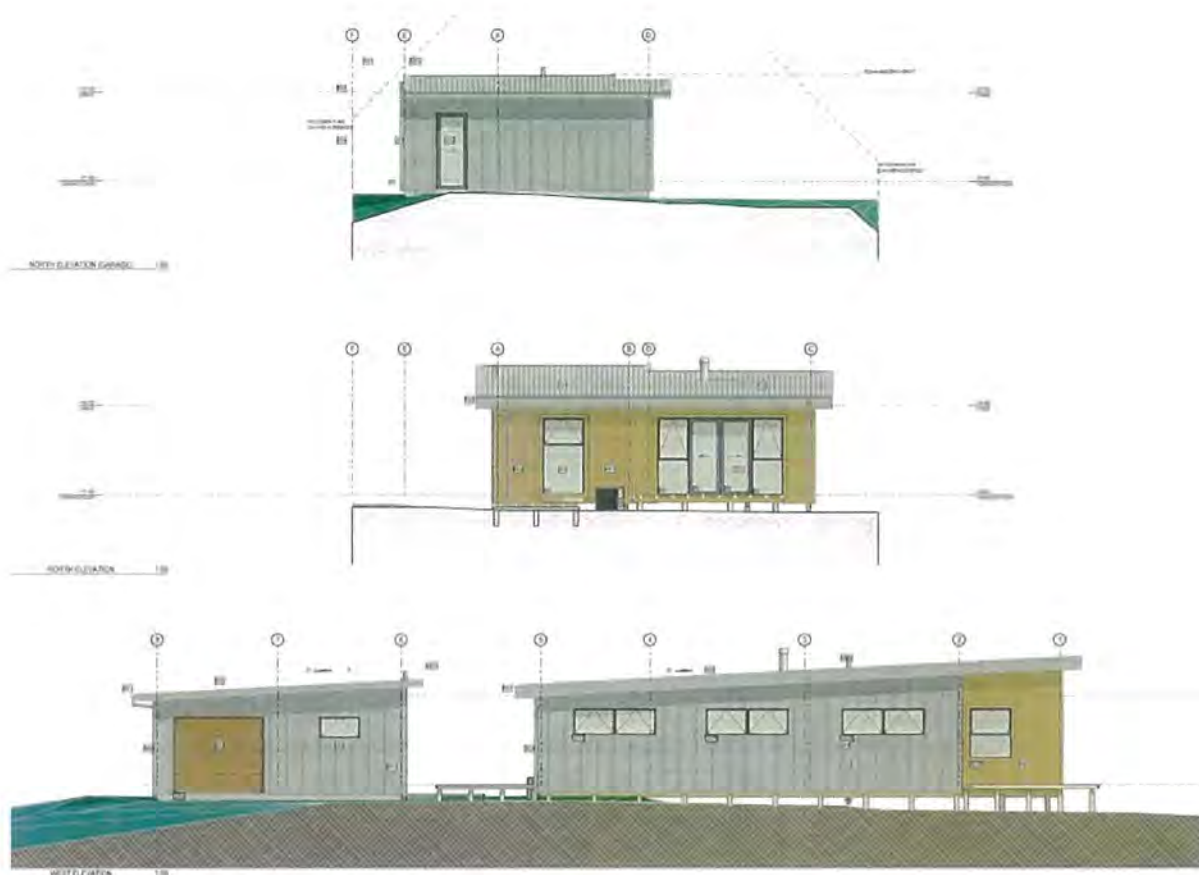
Elevations of the proposed dwelling and garage/minor dwelling
